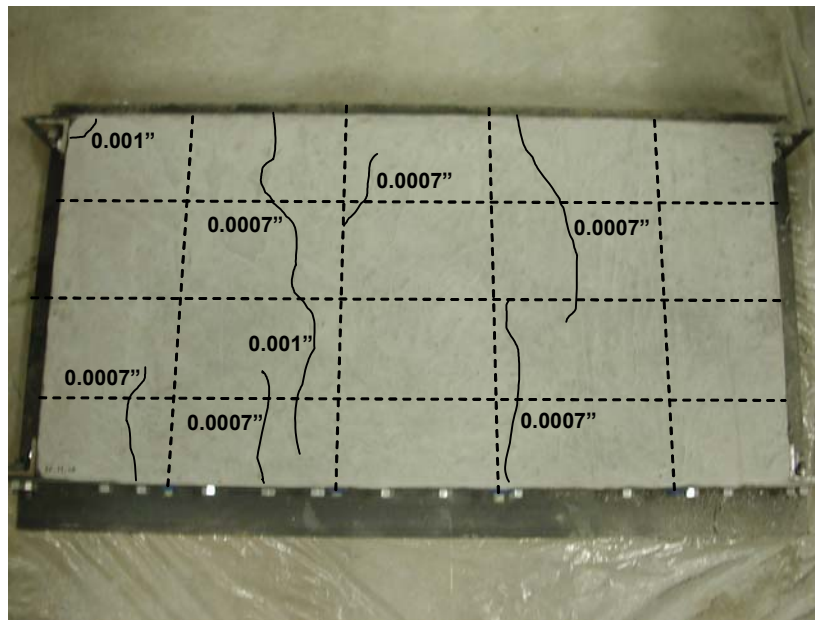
Shrinkage specimen after 28 days of age. Cracks are shown as solid lines along with crack widths at that location. Reinforcing steel locations are shown as dashed lines.
